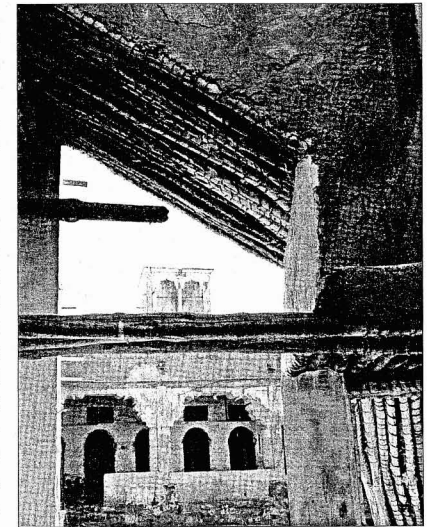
Traditional staircase construction, showing exposed mangrove pole soffit. Note jute binding
